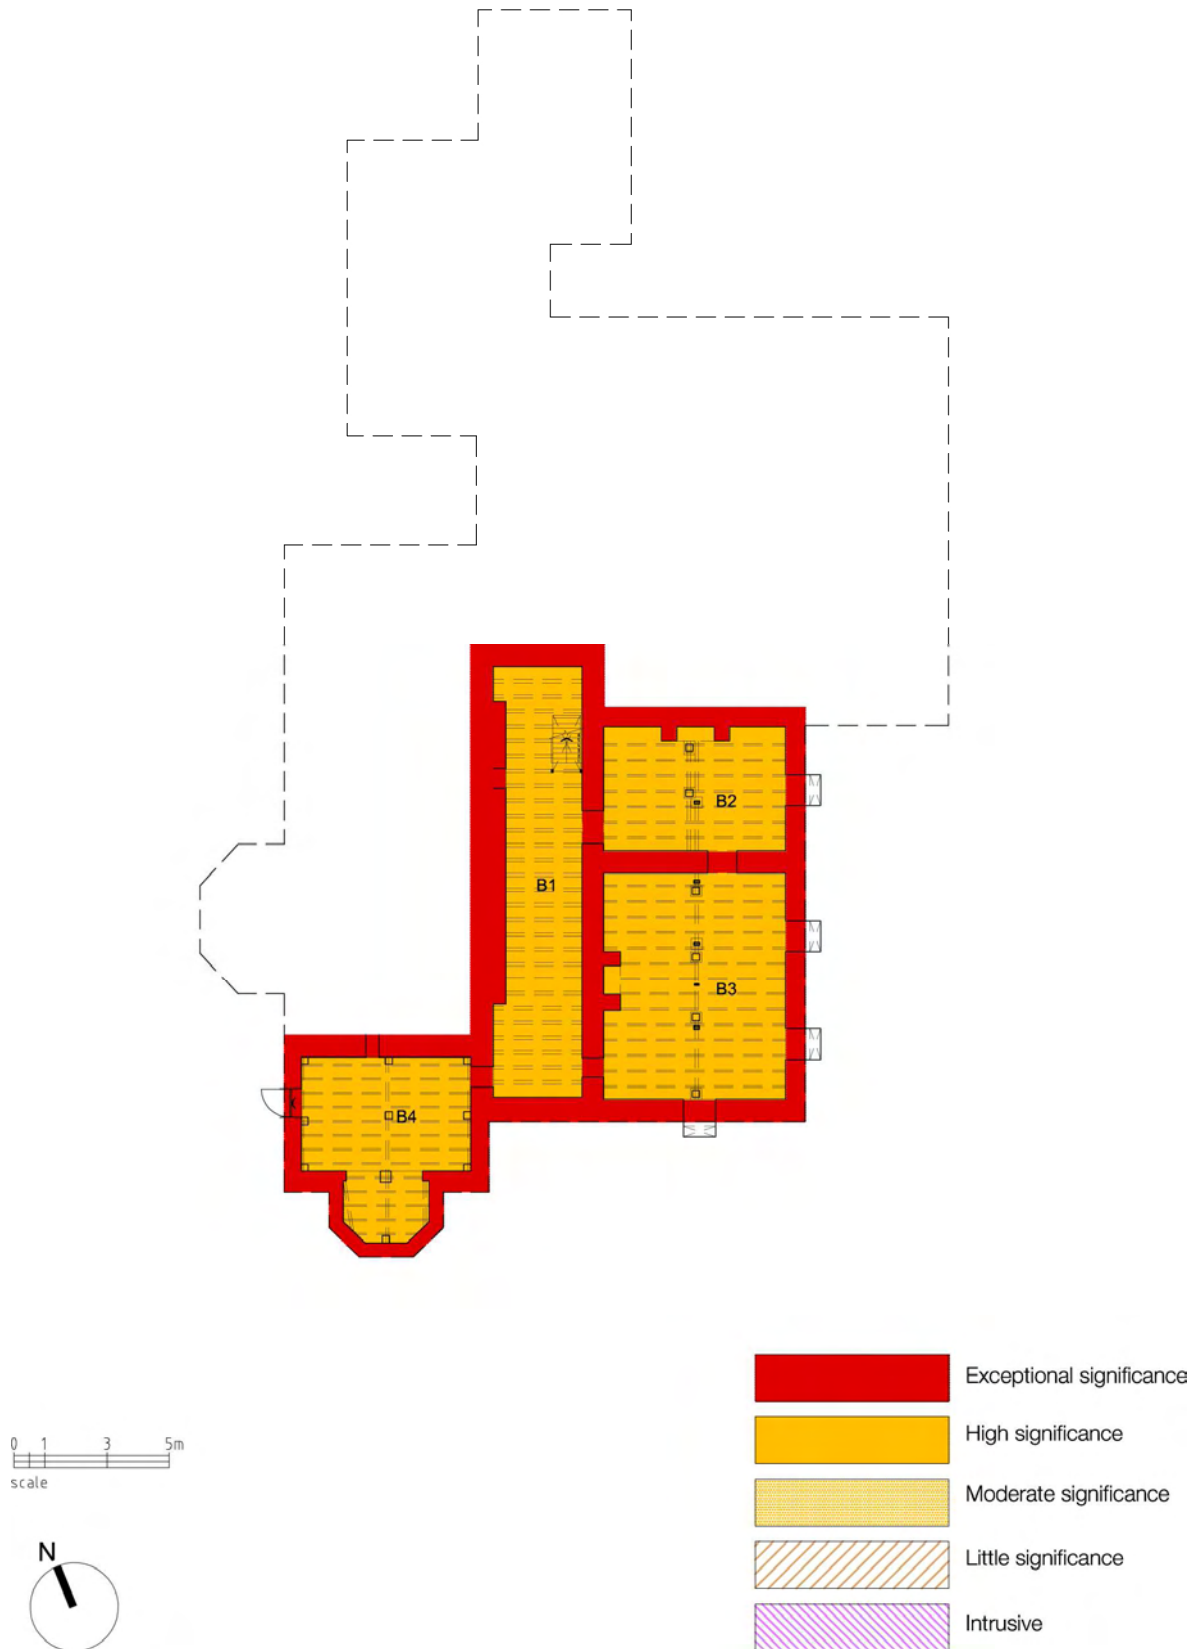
Basement floor plan of Graythwaite House, levels of significance. Not to scale.
